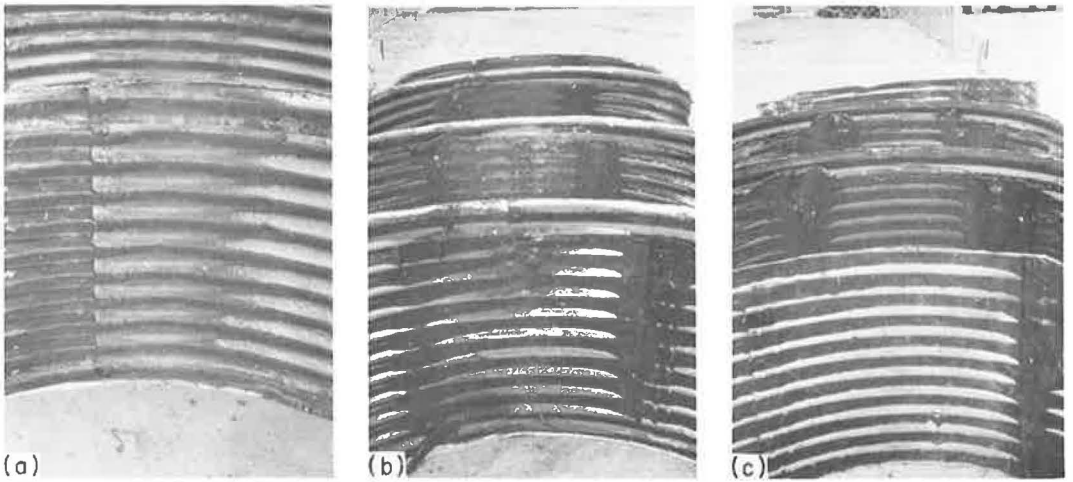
Abrasion test site, IV-SC1-5-C, Sta. 250+25, Bridge No. 37-165. Samples of the invert from: (a) galvanized steel section (note wear of rivet heads); (b) A.D.P.I. section (note loss of rivets at joint); (c) A.B.A.D.P.I. section.
